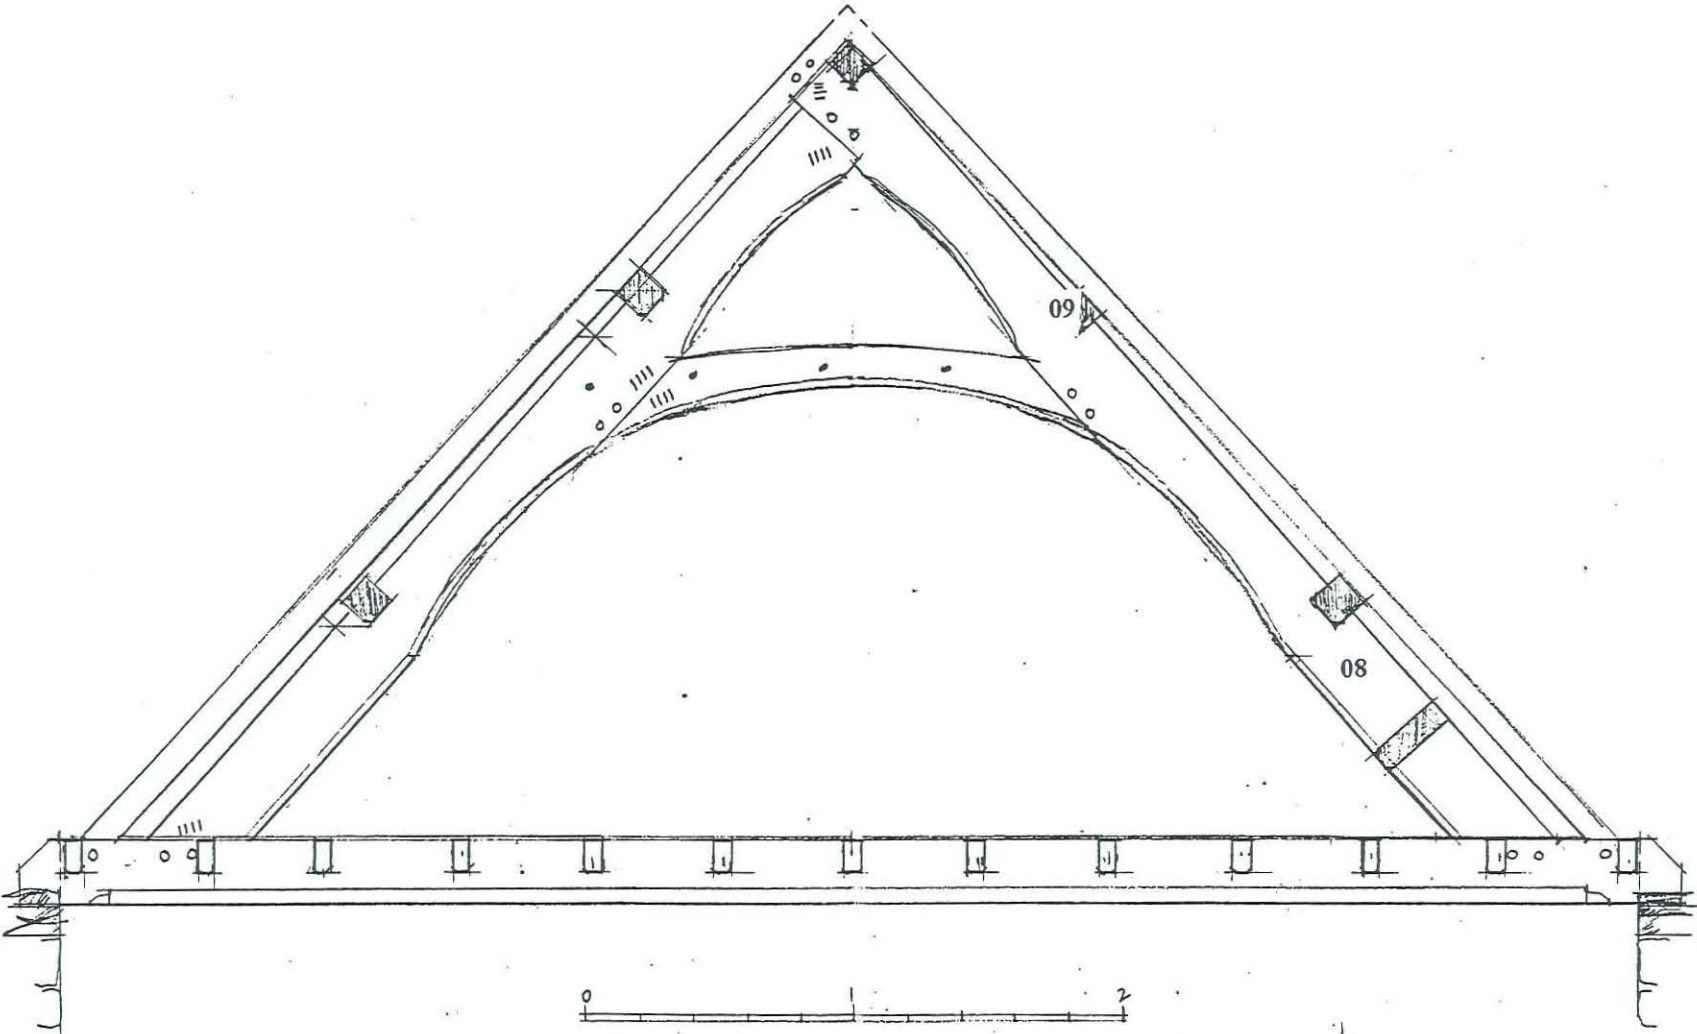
West range roof truss 5 (viewed from the south) to show sample location
